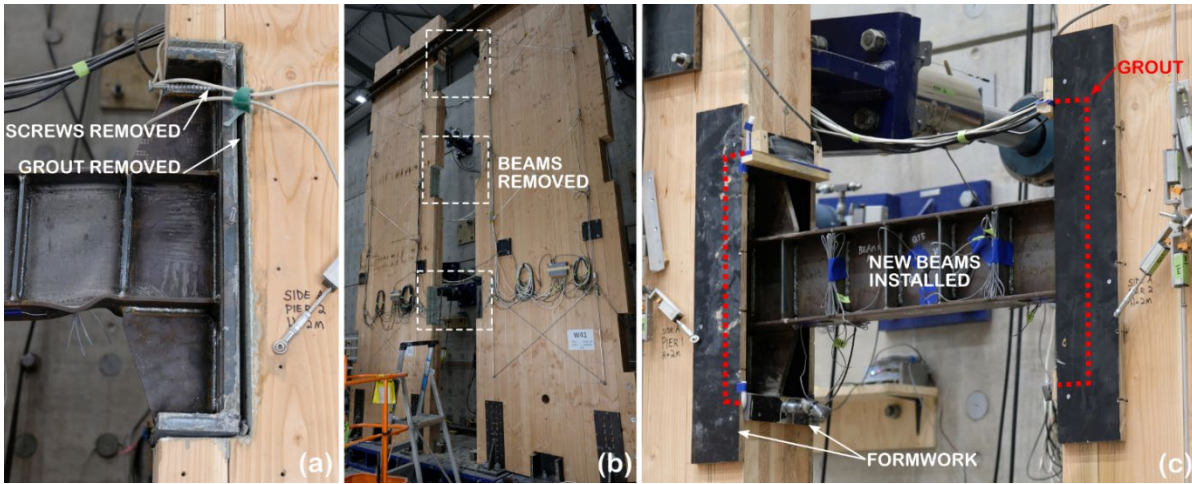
Repair method for damaged link beams: (a) grout and screw removal; beam removal; and (c) new beam installation.
